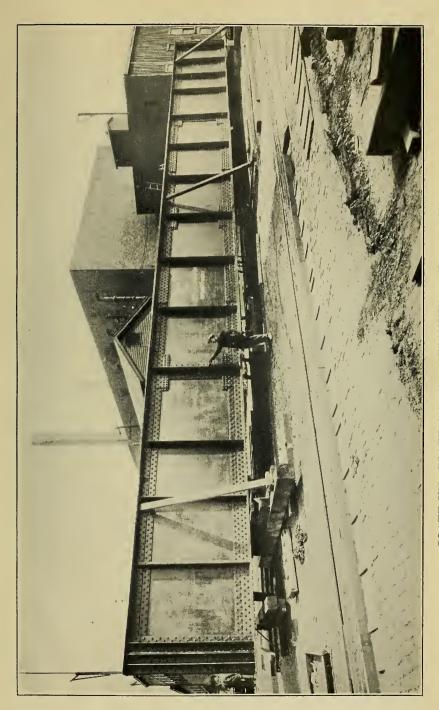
PLATE XV.—PLATE GIRDER, NEPONSET RIVER BRIDGE.
